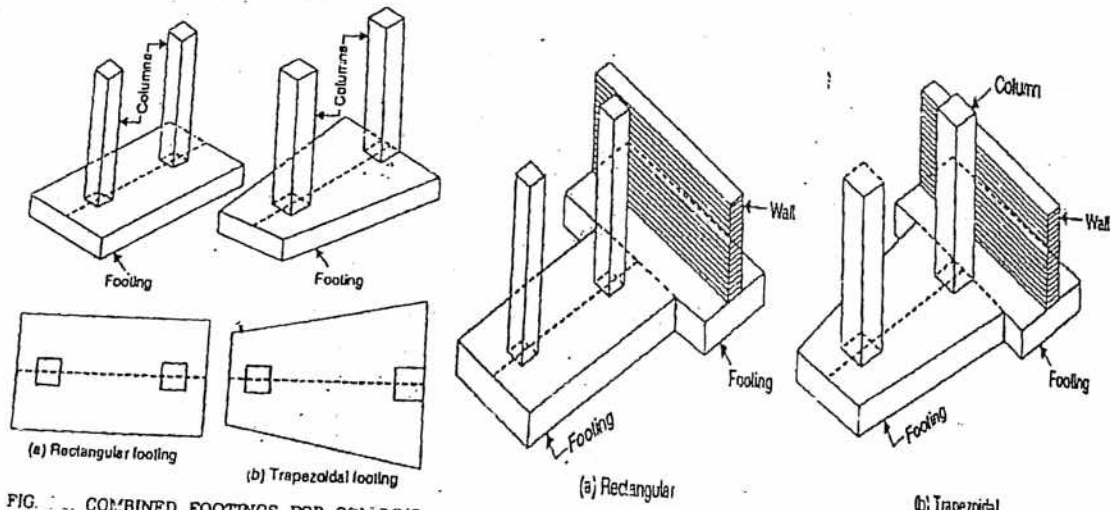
COMBINED FOOTINGS FOR COLUMNS.
